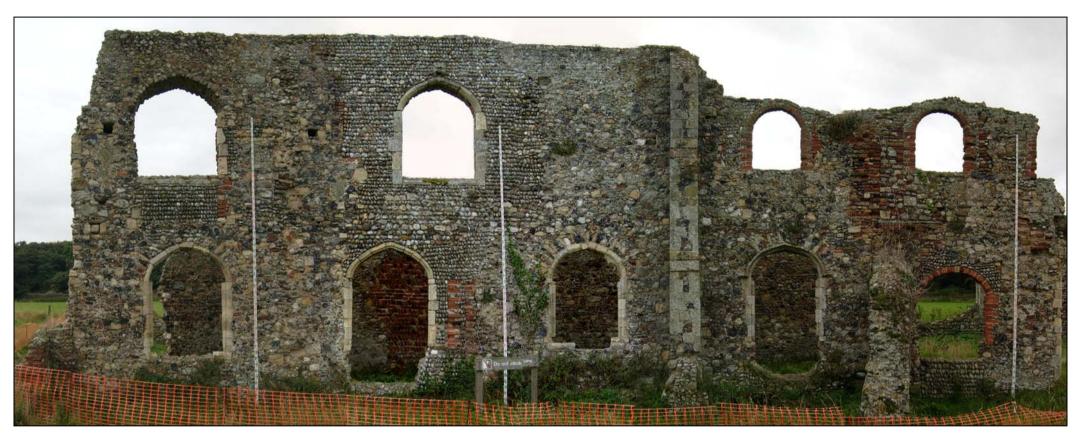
c.1:70 composite photographic elevation of the refectory north wall 0050
